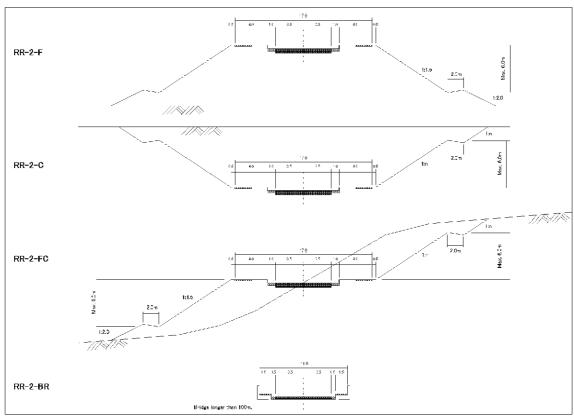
Typical Cross Section of Expressway (New Construction, 6-lane)
